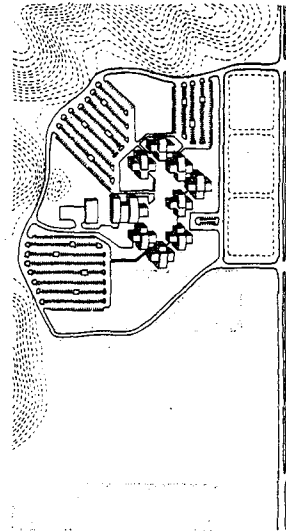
SCHEME 7E/SITE PLAN.
